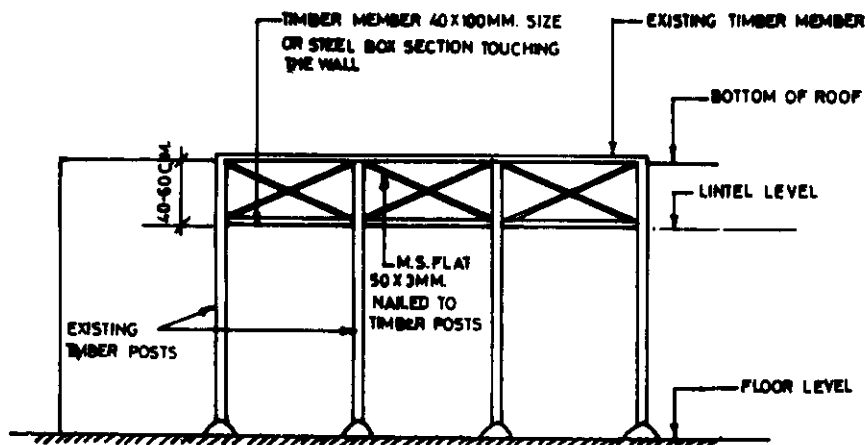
STRENGTHENING OF FRAME AND WALL WITH SPANDREL BRACING
